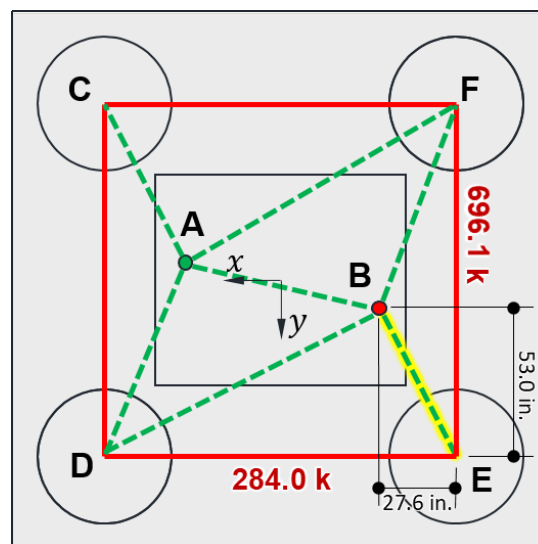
Plan view of 3D strut-and-tie model: Load Case VII
